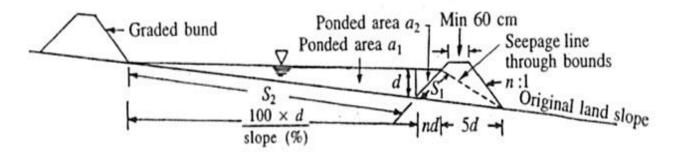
Design layout of graded bund. (Source: Das, 2002)
